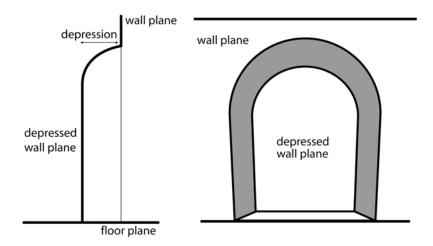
The Schematic View of the Niche as the Depressed Wall Plane, House of the Anchor (Şeker Ilgın)
